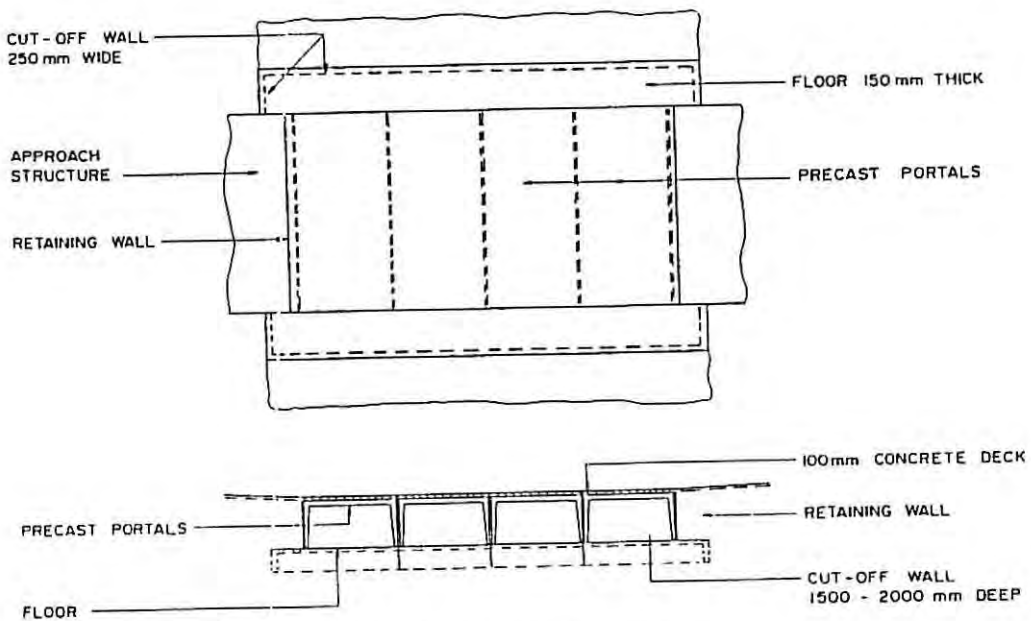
EXAMPLE OF A PORTAL CAUSEWAY
